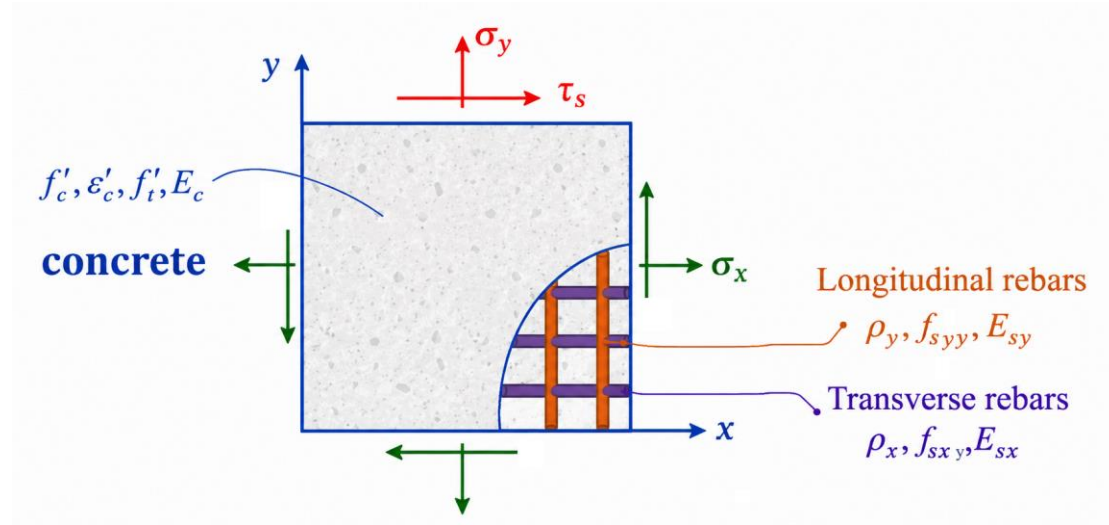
A reinforced concrete membrane element under flat stress, adopted from [35]
